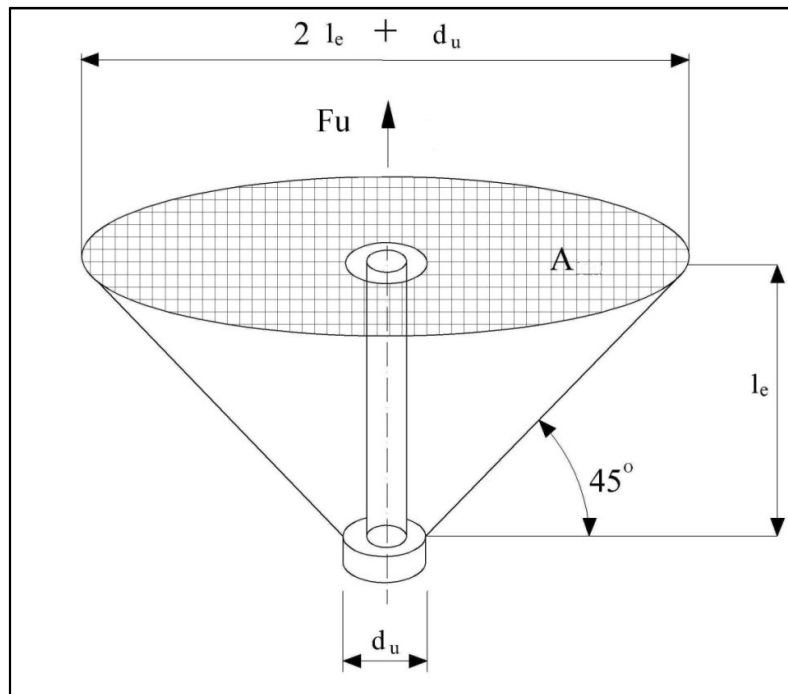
The projected area of a single anchor loaded in tension [1]
